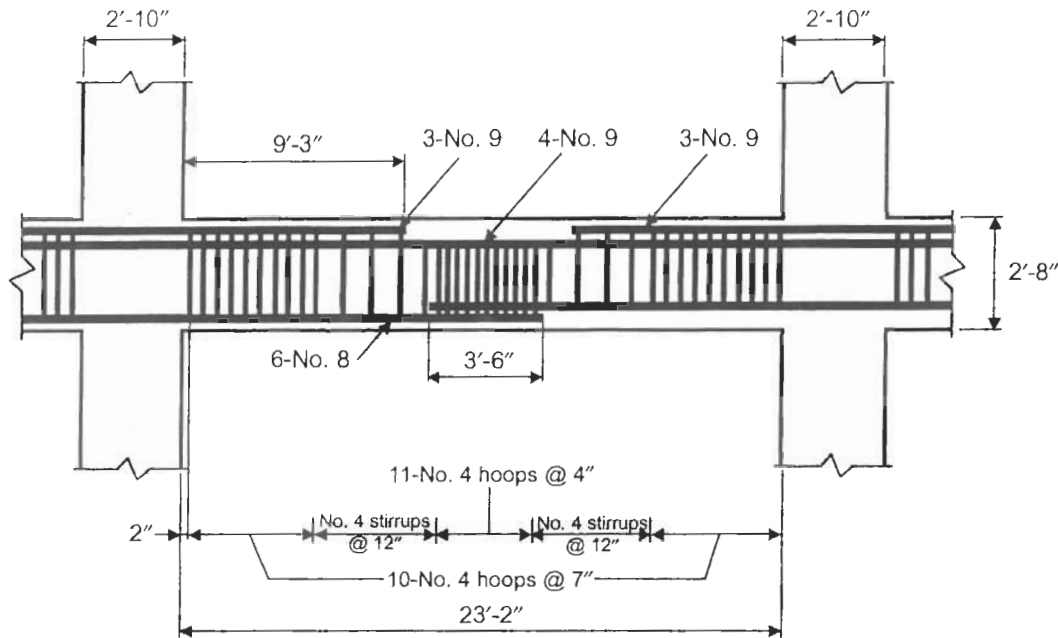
Reinforcement Details for Beam C4-C5 at the 2<sup>nd</sup> Floor Level (SDC E)
